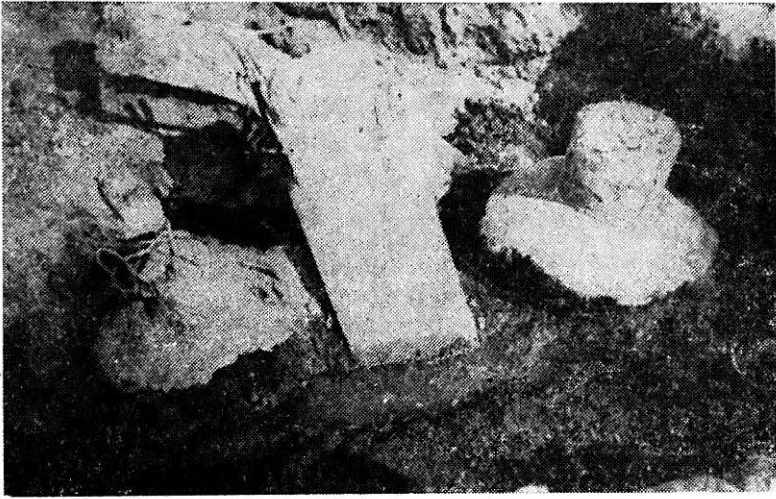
Configuration of Three Piles and Column by the Side of Drain after Collapse Indicating Pile Inclination Towards Drain and Column Inclination Away from the Drain.
